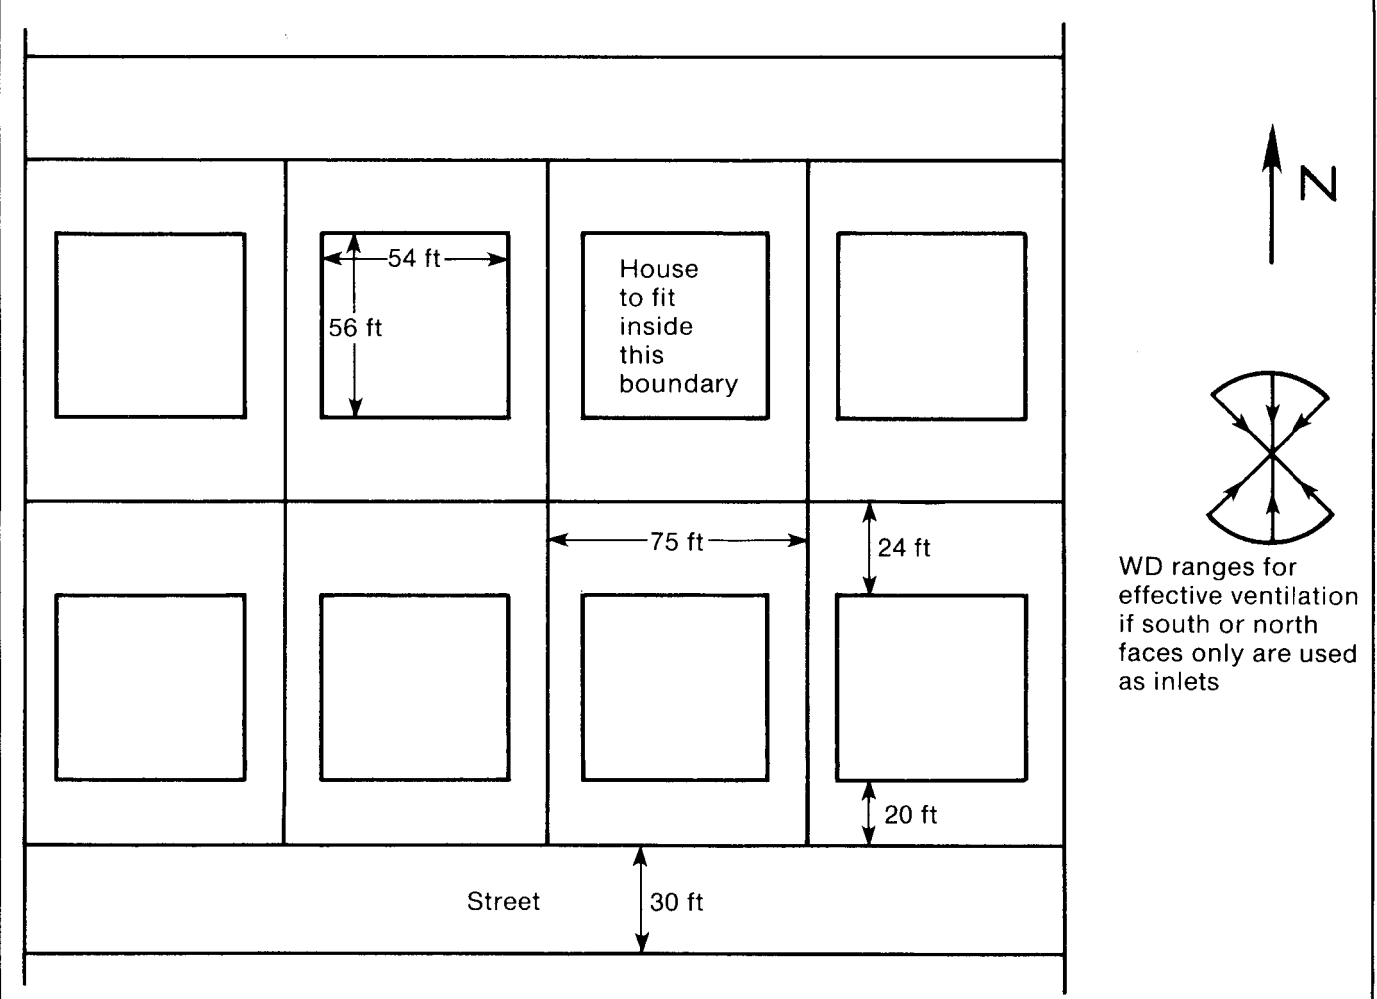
Subdivision Layout for 75 ft x 100 ft Lots
